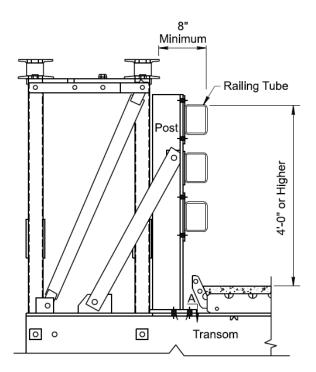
Vehicular Railing Offset Requirement for Railing Height of 4 feet
